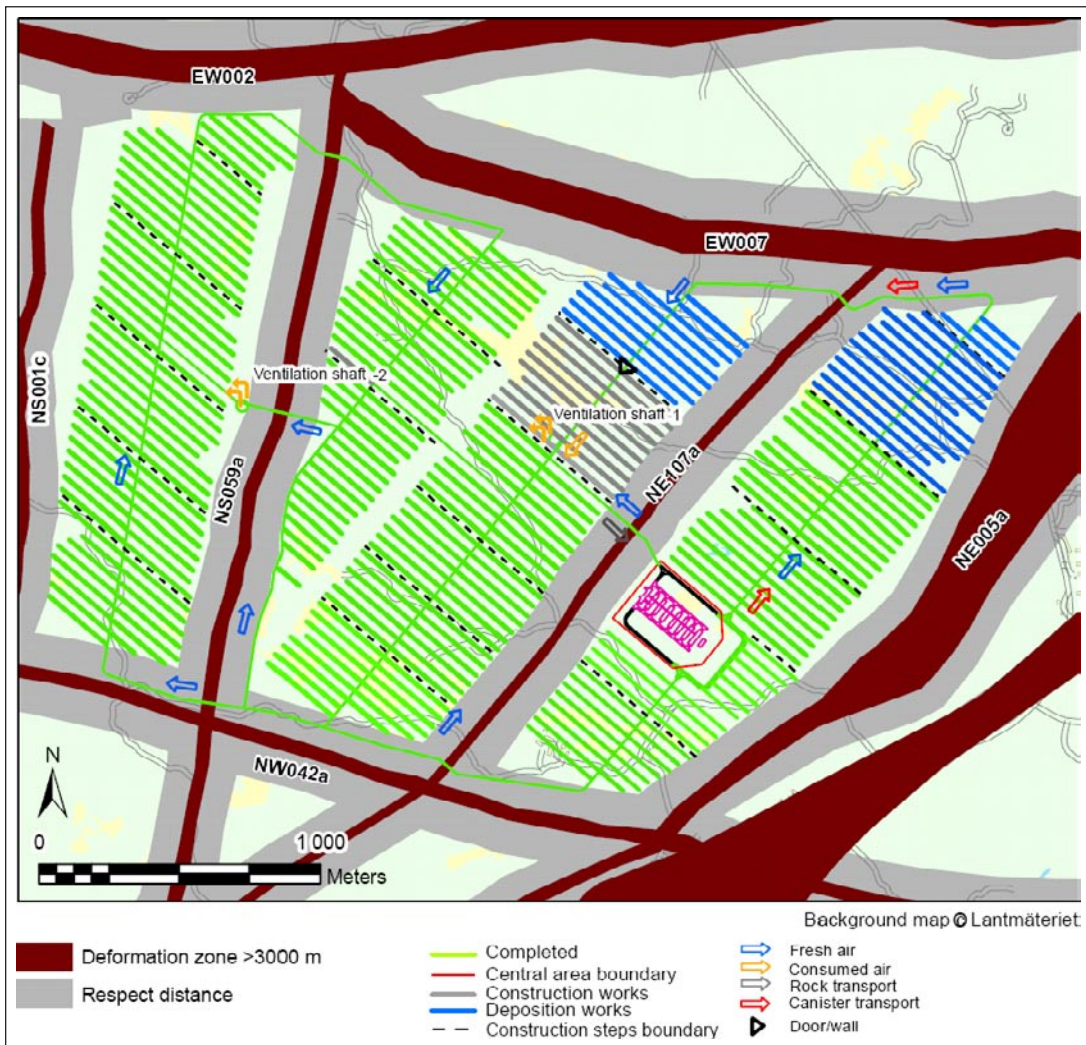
Excavation in construction step 19 and deposition works in construction steps 17 and 18.
